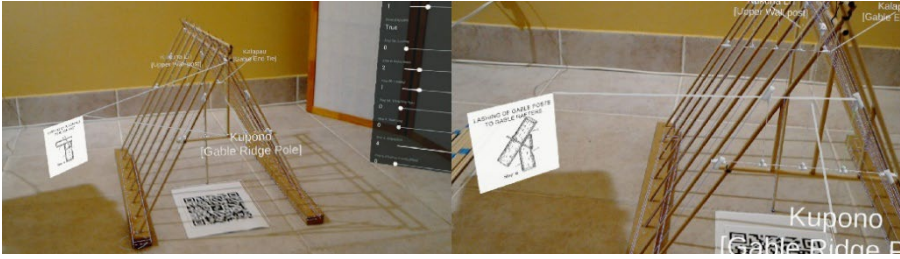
Lashing Instructions of Pou Hana (Ridge Post) and Kauhuhu (Ridge Pole)
